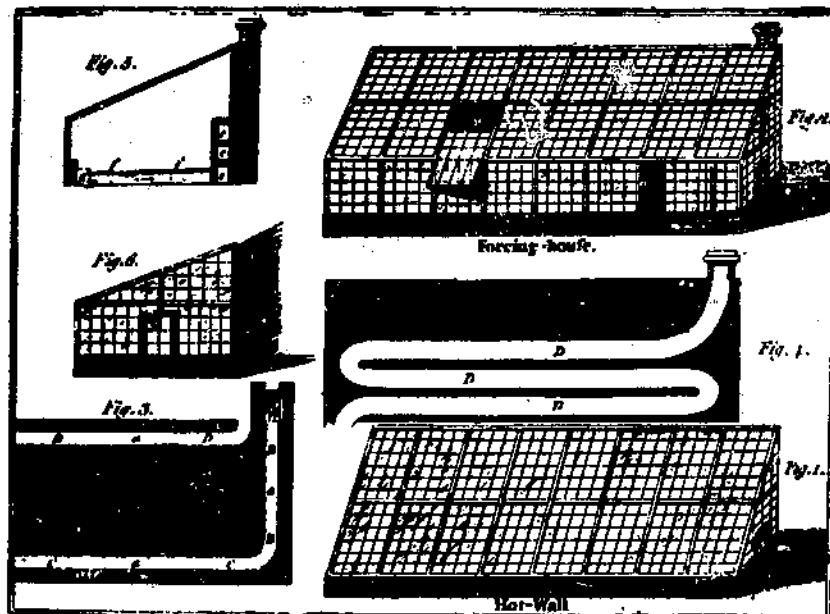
Typical heated greenhouses of the late 1700's, showing arrangement of heating flues. At the time, these structures were known as forcing houses or hot walls. (England, 1789.)
